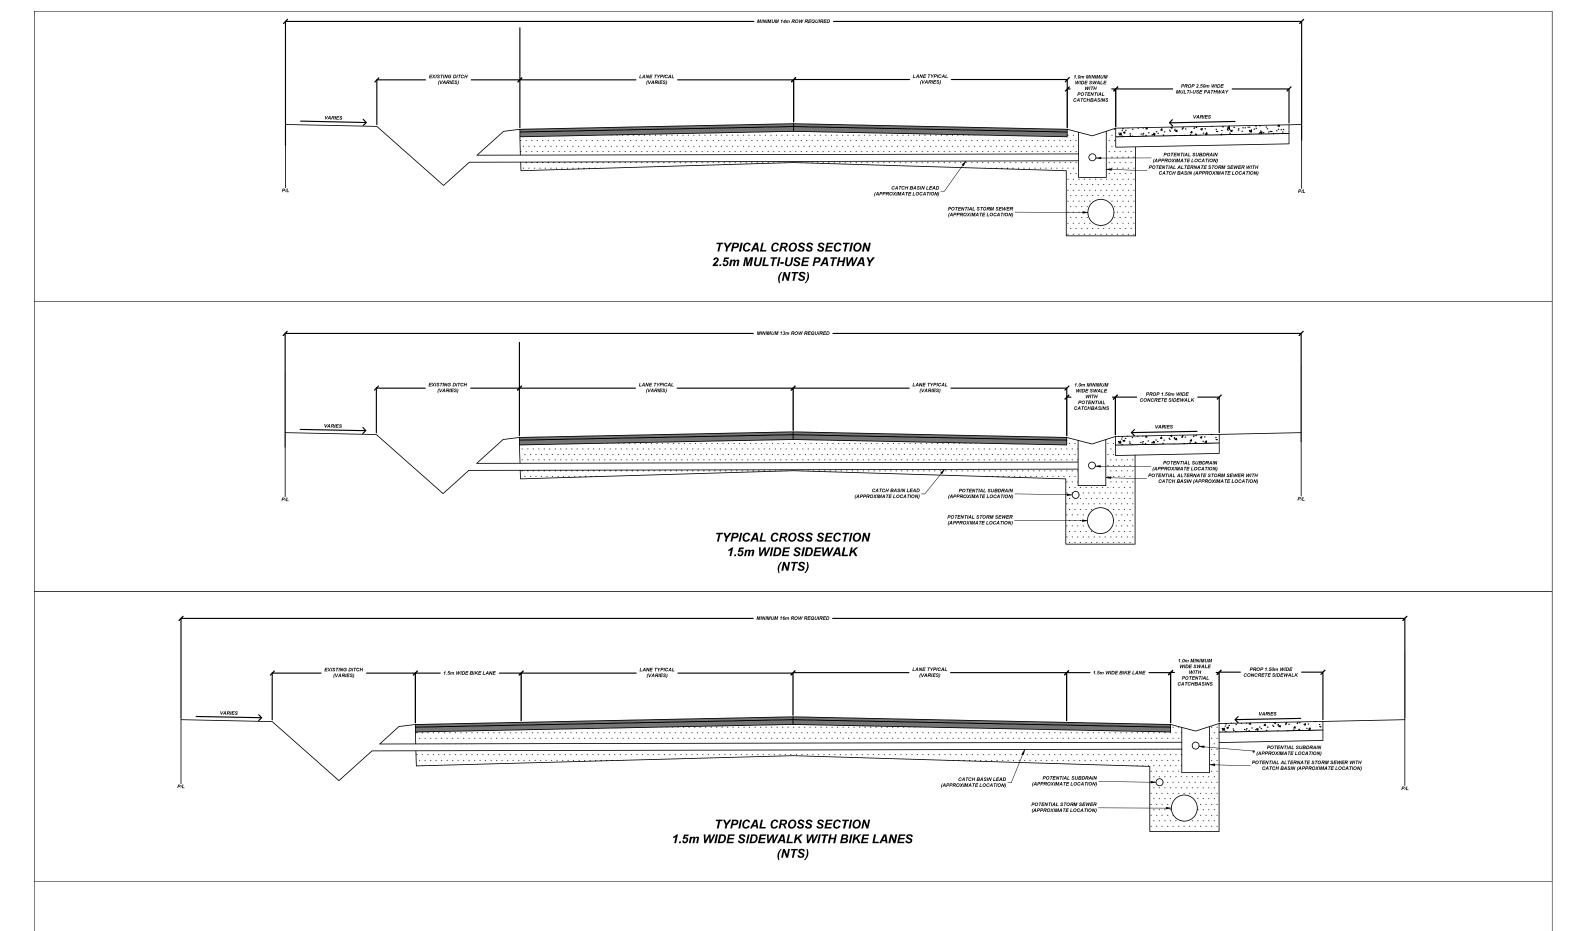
TYPICAL PATHWAY CROSS-SECTIONS
